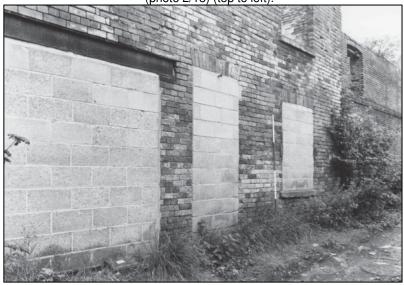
Building D, GF E elevation, looking W (photo 1/15).
